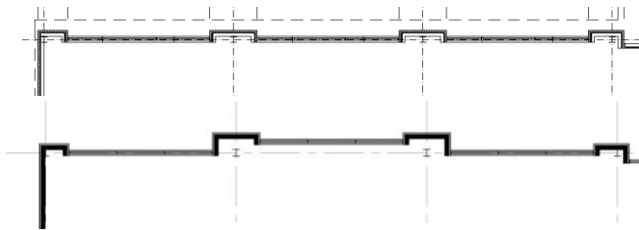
This shows the existing floor plan (top left) versus the modified floor plan (bottom left) and the proximity of the columns and beams to the exterior walls.
